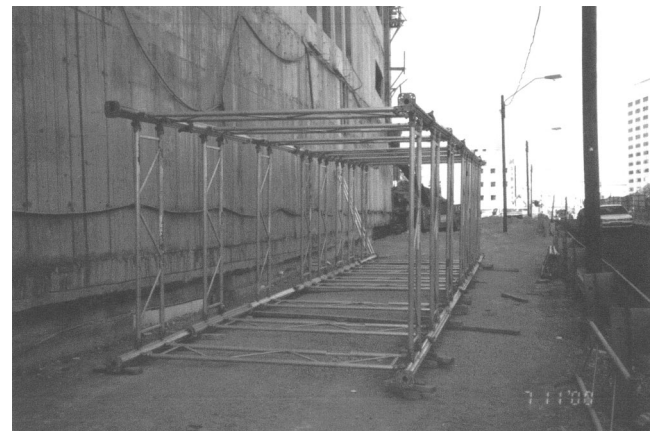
Horizontally preassembled 13-m-long PERI Multiprop tower section
